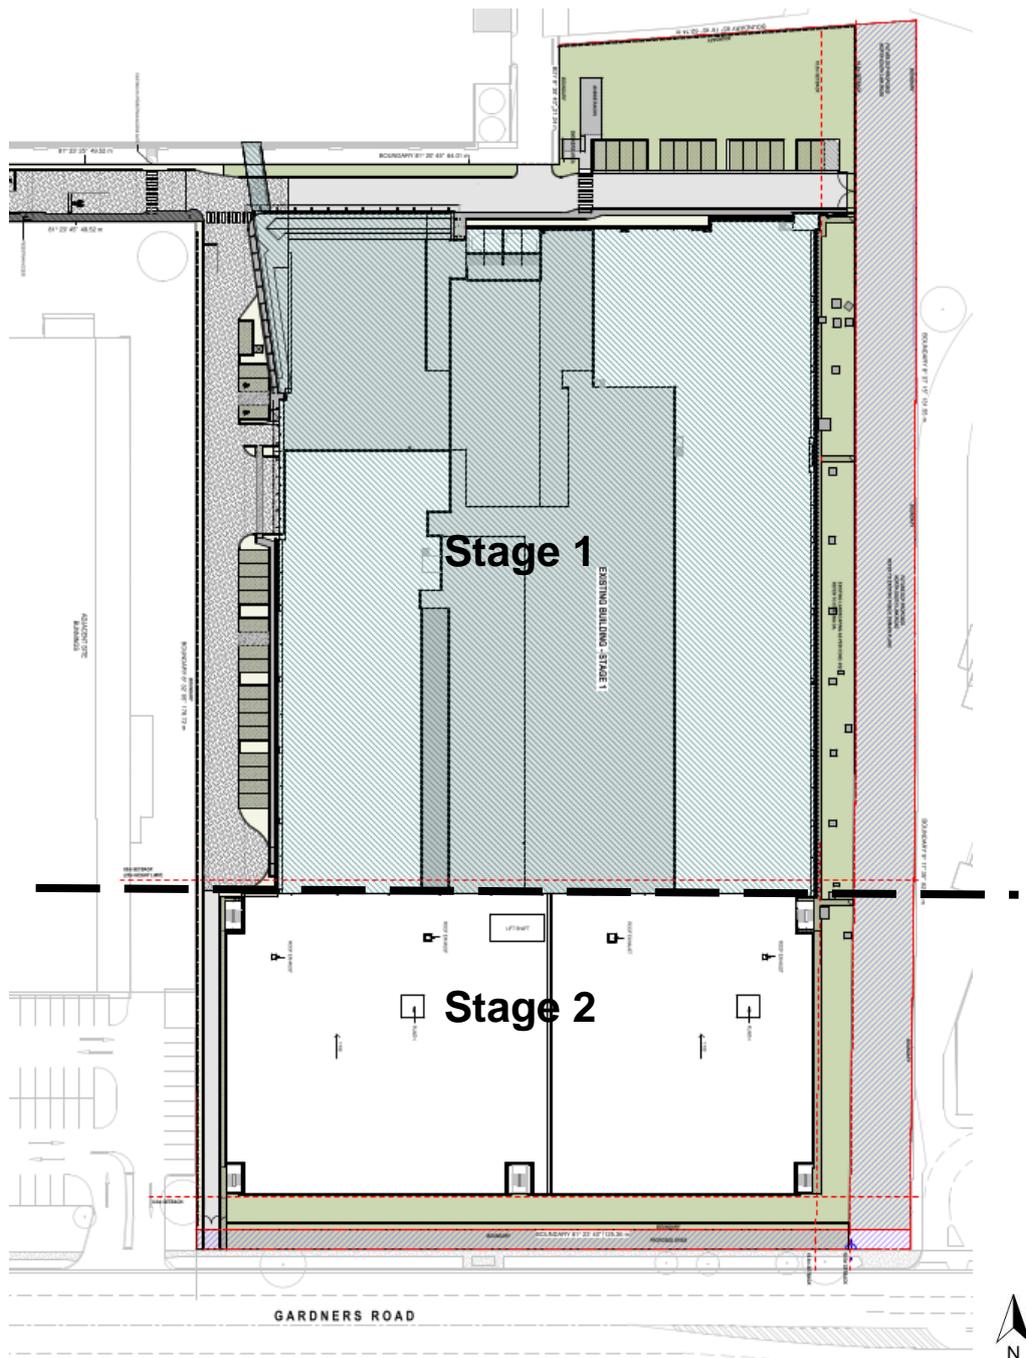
Proposed roof plan of stage 2 as labelled and below the dashed black line
